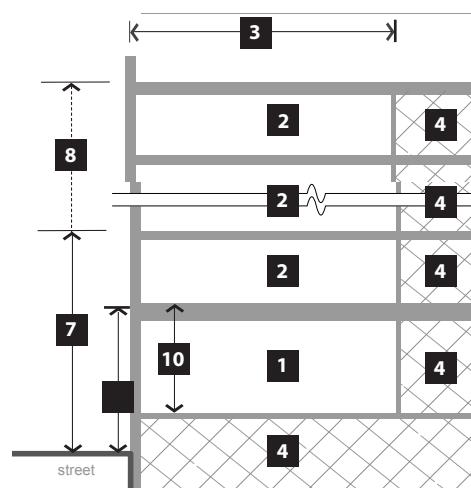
Civic building height and use diagram shown with basement and rear building interior parking and parapet roof type. Not to scale.
